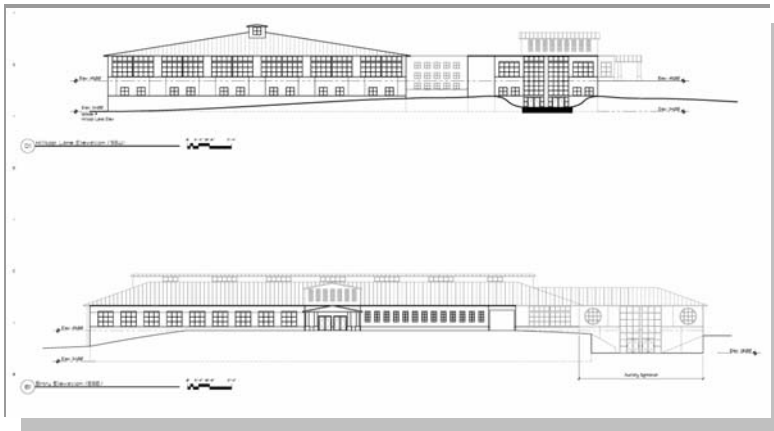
Architectural drawings for the new Pip Moyer Recreation Center at Truxtun Park
